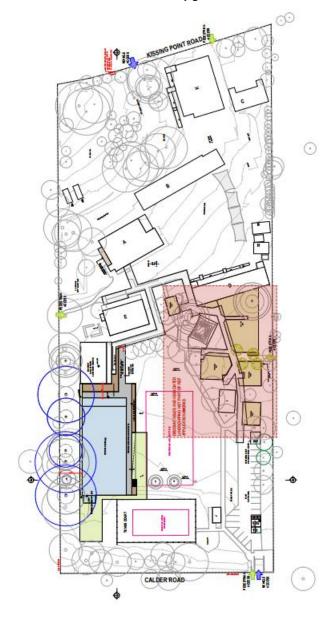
Proposed Scope of Works (Source: Fulton Trotter Architects, Proposed Site Plan (Rev 05))
